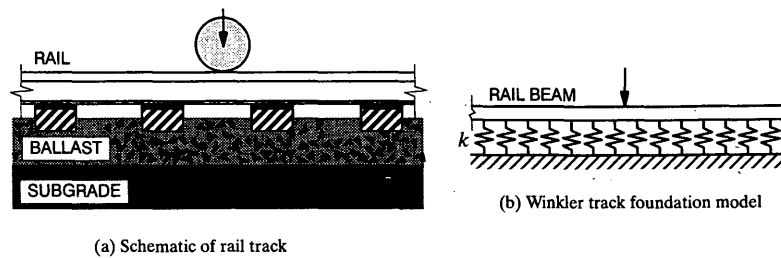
Rail track formation modeled as a Winkler foundation.
